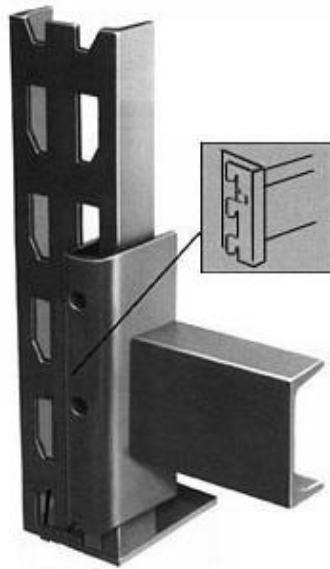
Connection of beam and column in a steel storage rack, Jarke (2007)
